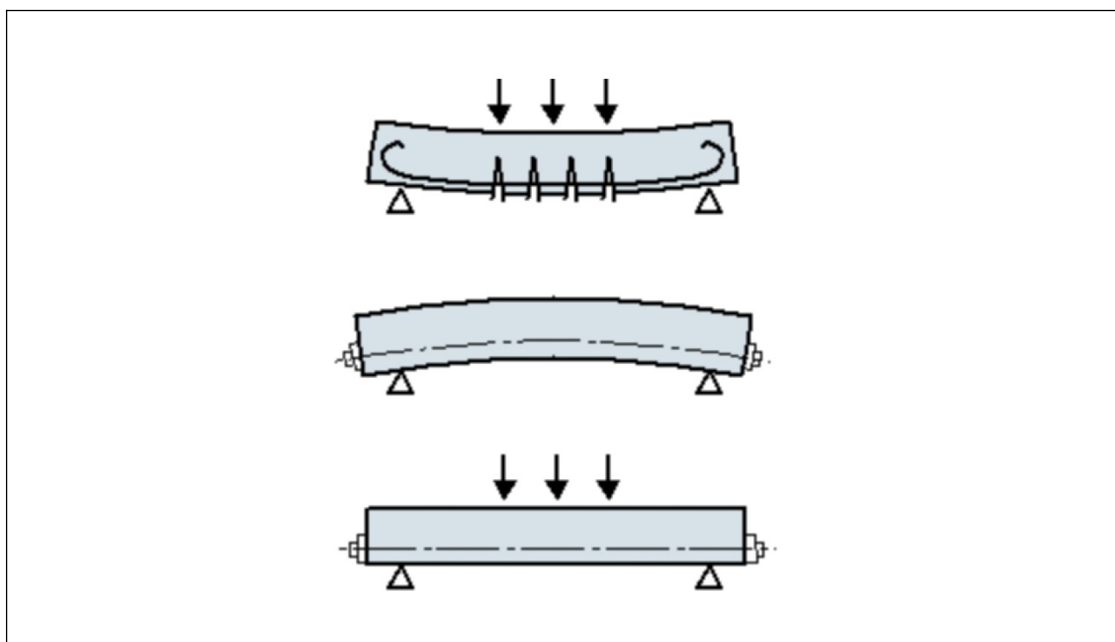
Higher load bearing capacity without cracking of prestressed beam
